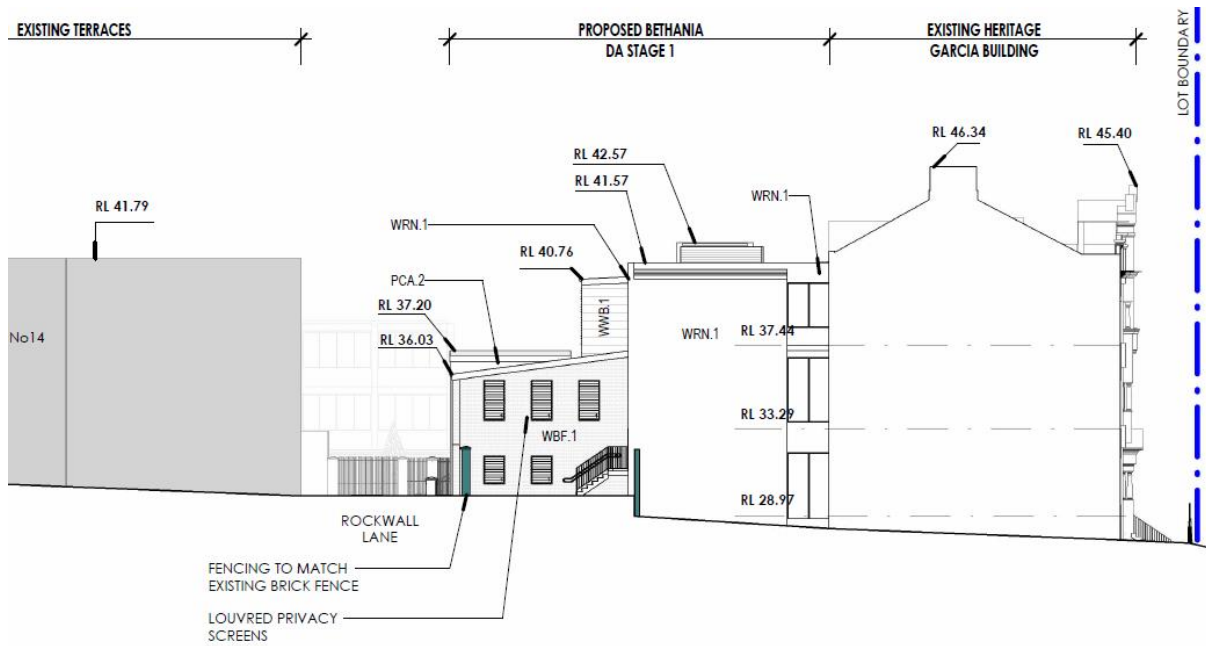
Proposed Elevation - Bethania (Eastern Elevation)
